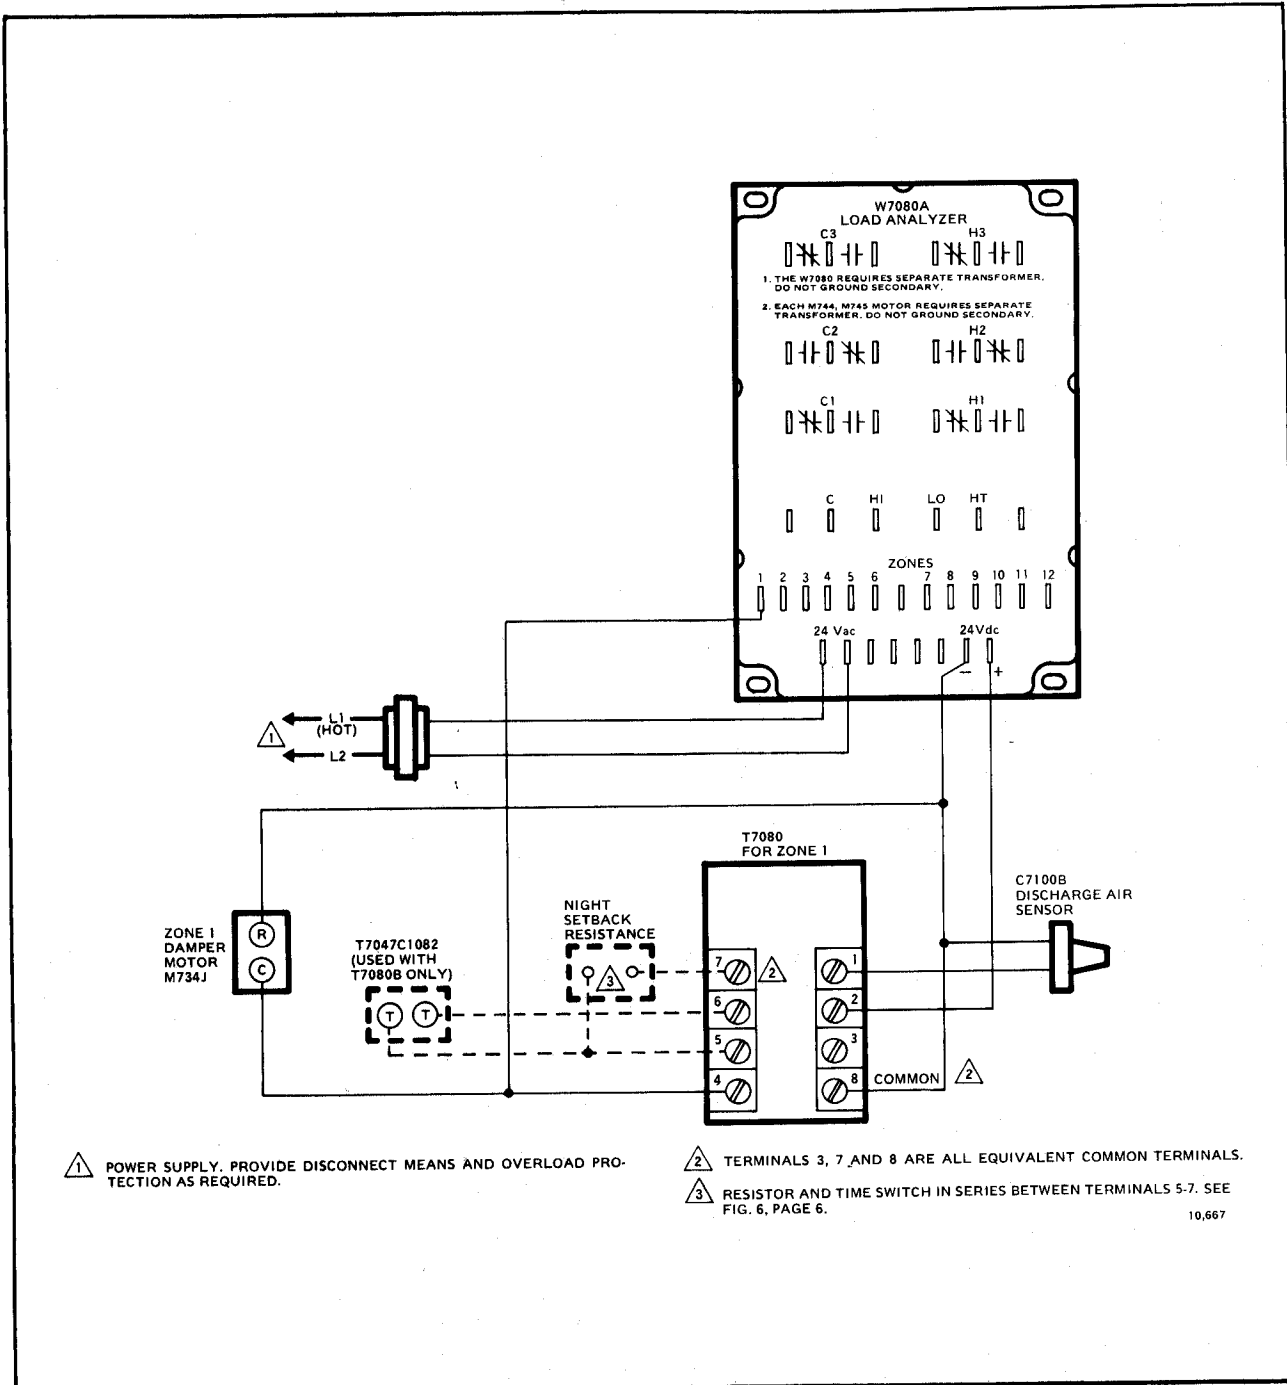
W7080 AND T7080 WALLPLATE WIRING CONNECTIONS.
